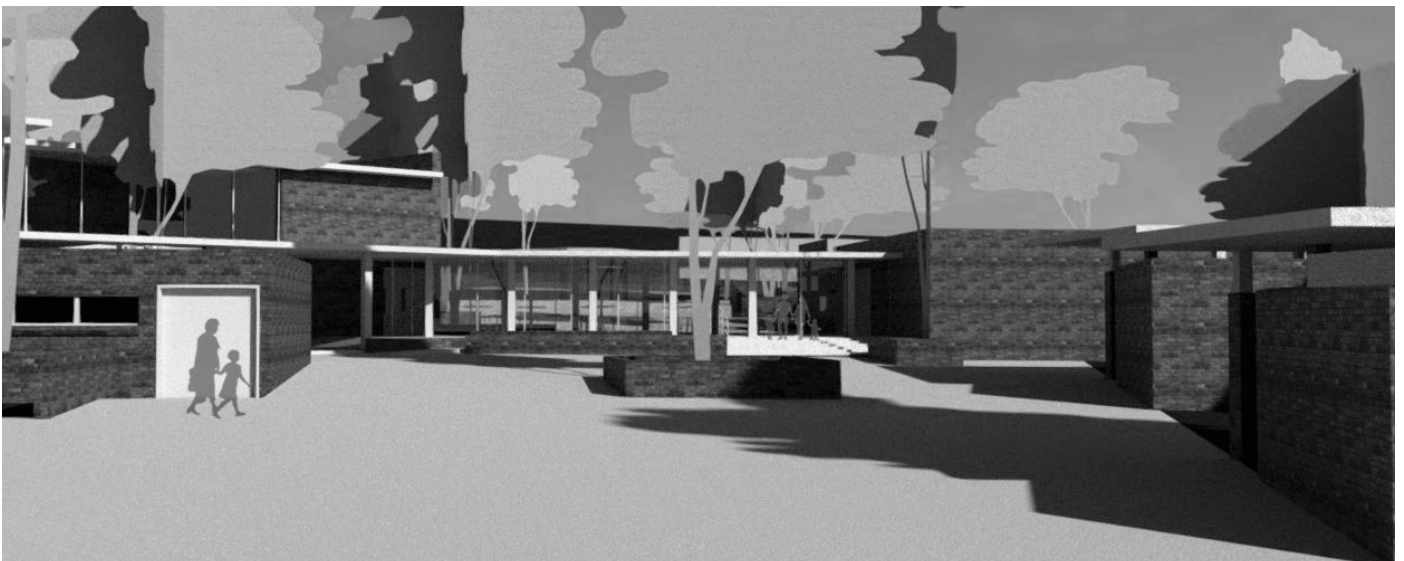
Hall Foyers And Traditional Cremation Plan (Author)
